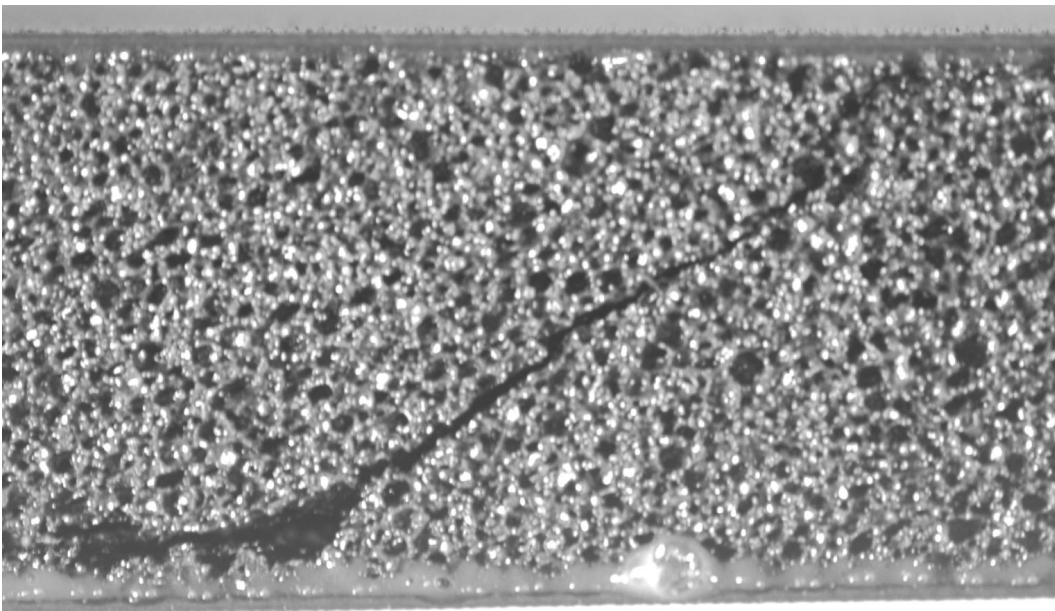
Sandwich Beam Failure (5×) (Specimen 8)
